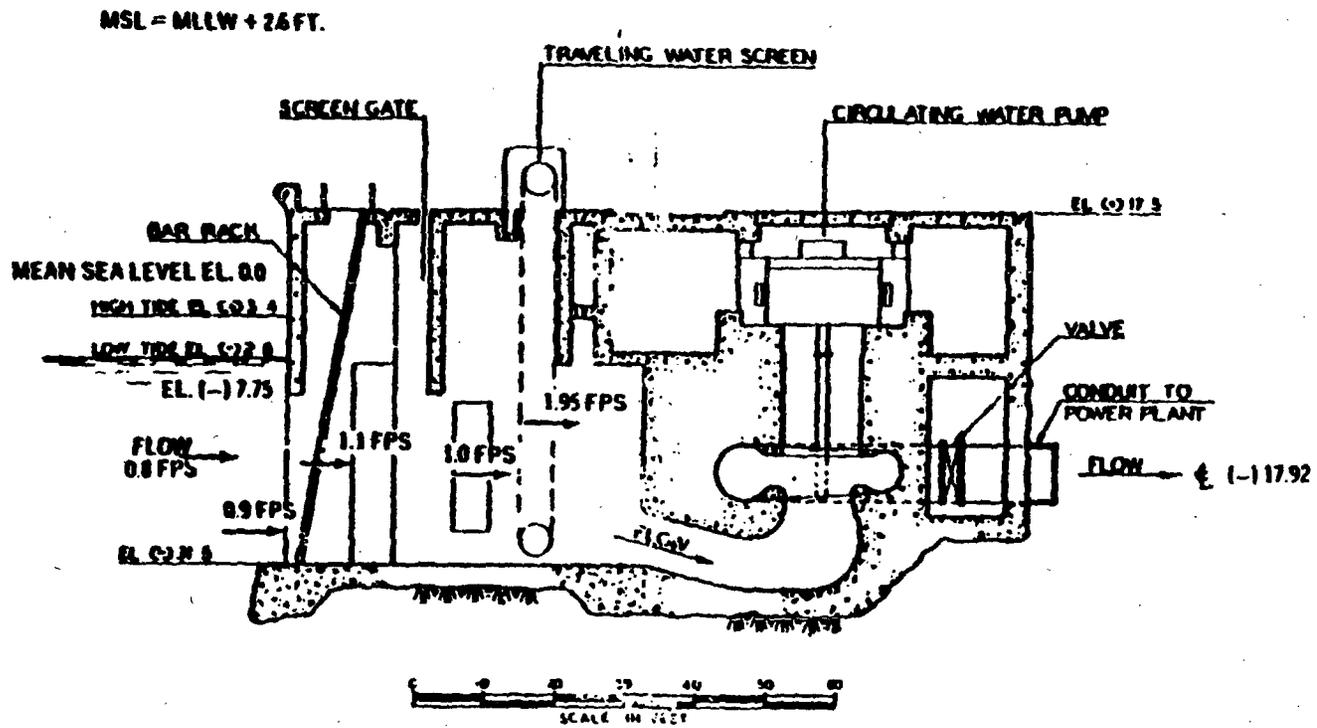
Typical section, cooling water intake structure, Diablo Canyon Power Plant. (PGandE 1977a)
